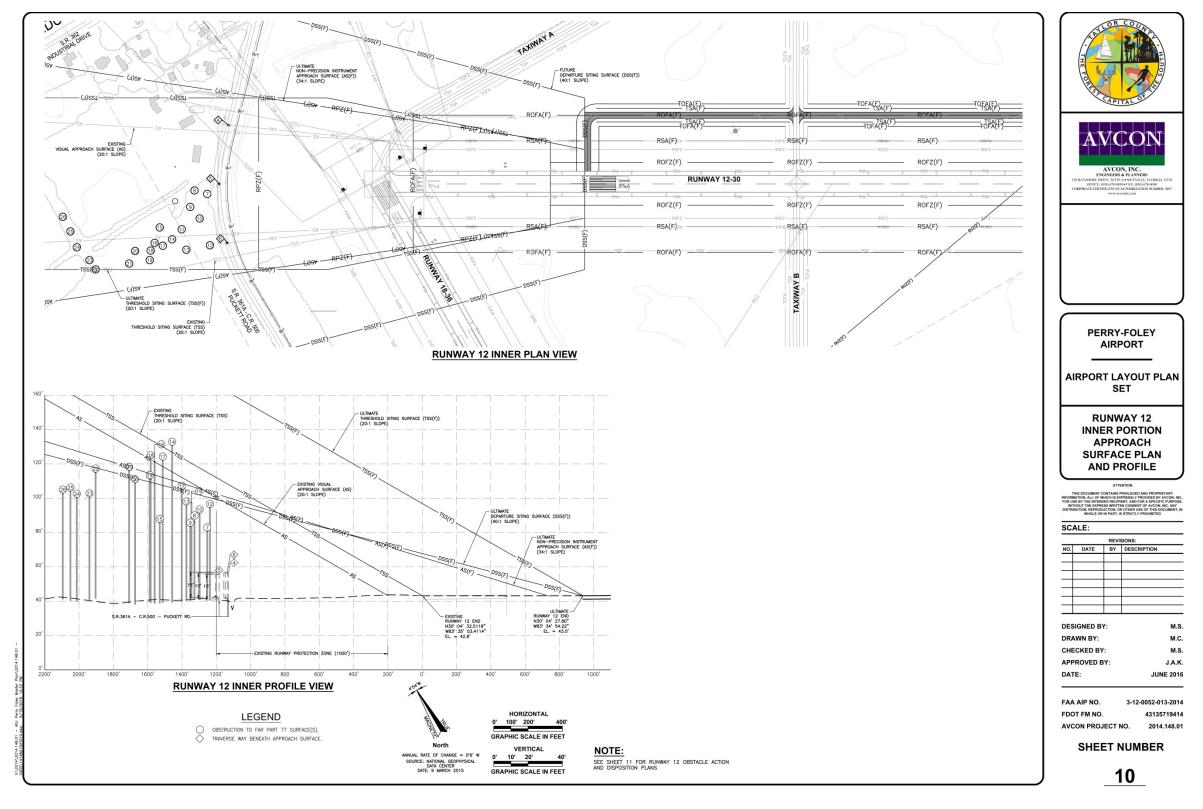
RUNWAY 12 INNER PORTION APPROACH SURFACE PLAN AND PROFILE
